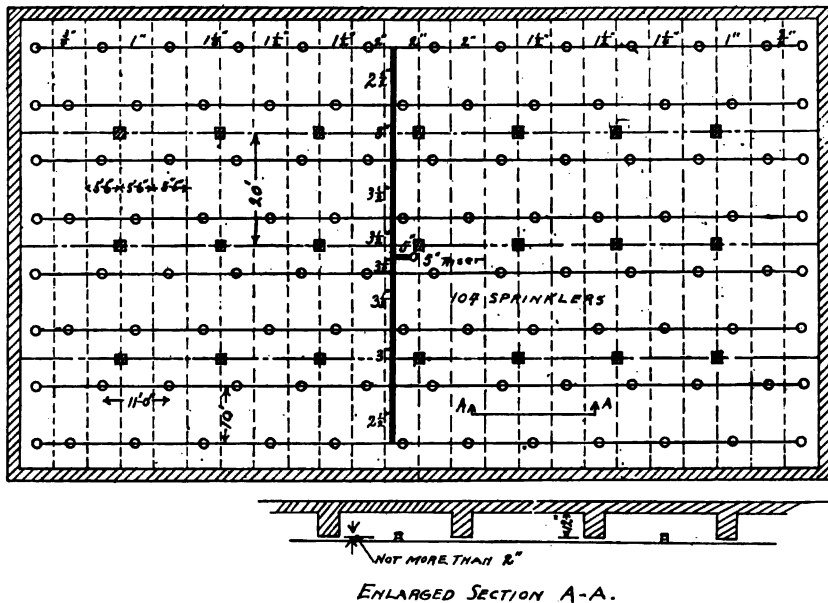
SKETCH SHOWING METHOD OF SPACING SPRINKLER HEADS UNDER FIREPROOF CEILING. (BEAM CONSTRUCTION) WHERE BEAMS ARE NOT OVER 12 INCHES DEEP.
